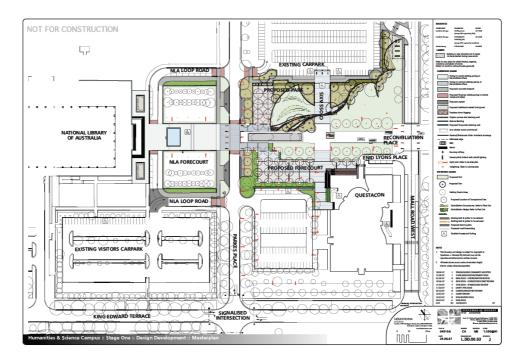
Master Plan Stage 1 (Refer to Appendix A for Proposed Coach Manoeuvring analysis Along Mall Road West)
